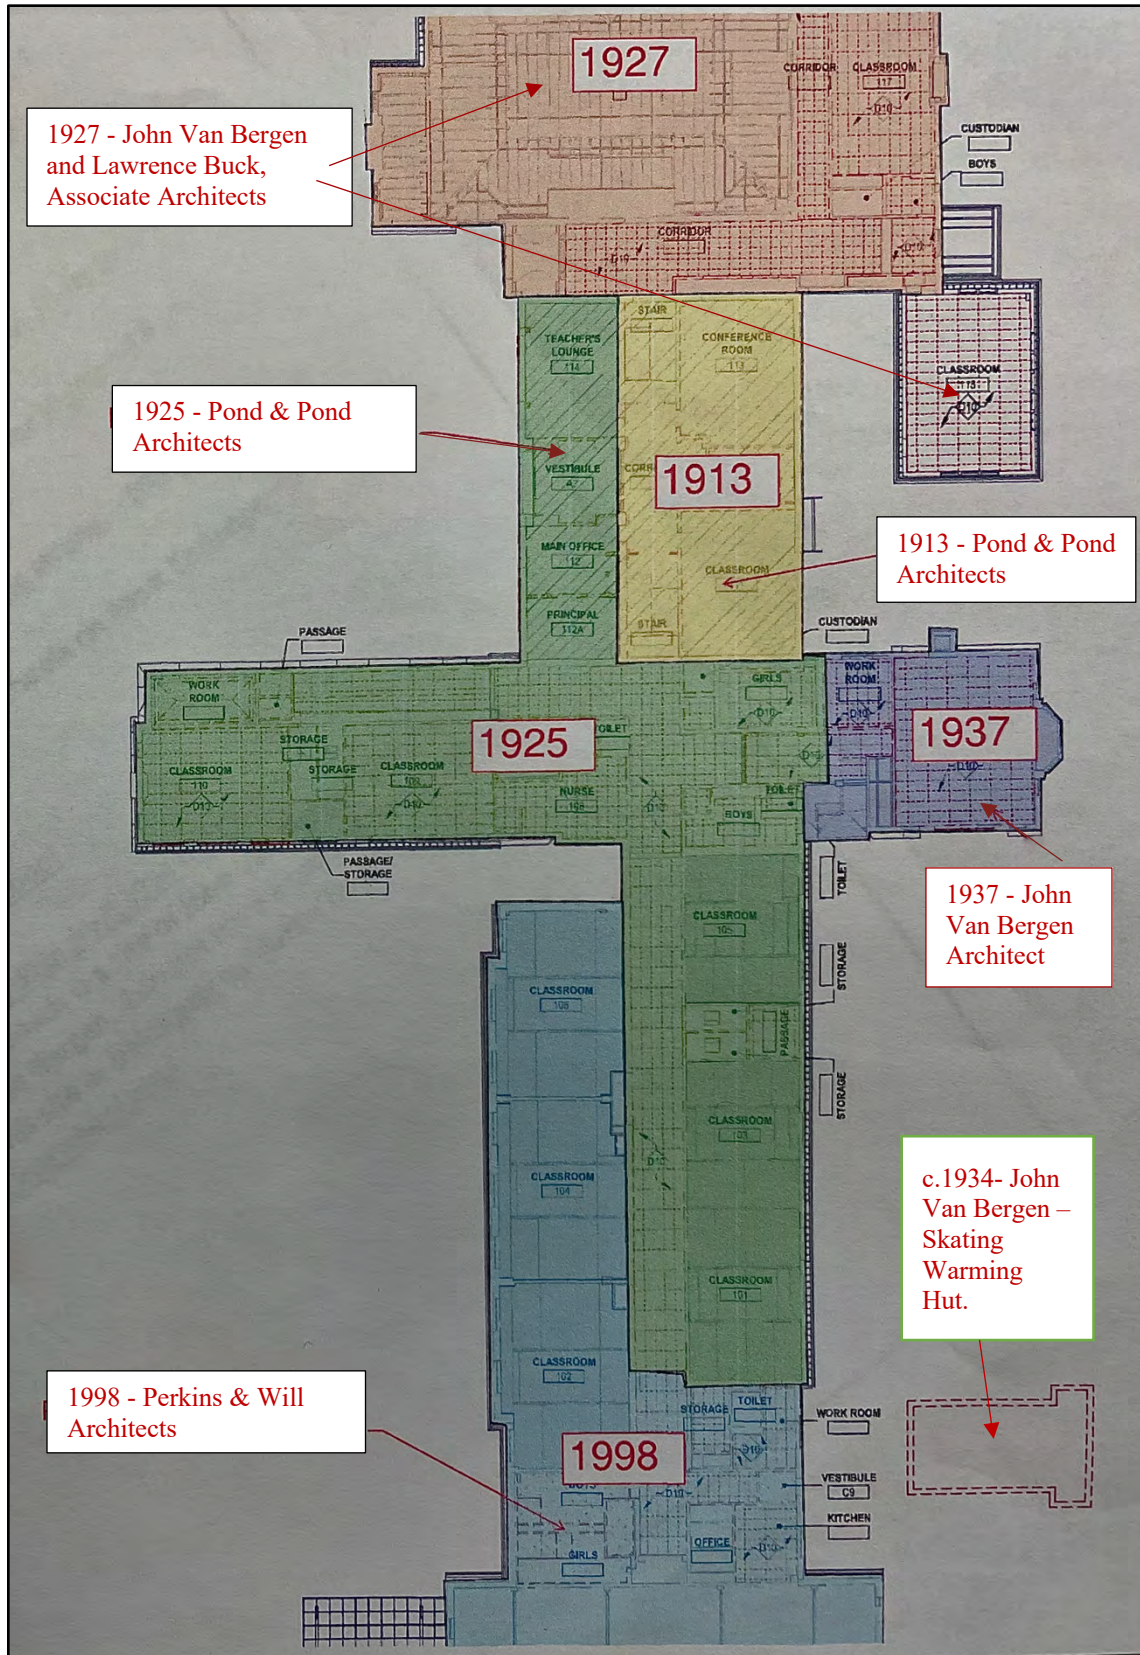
Color-Coded Floor Plan of additions, dates and architects.
